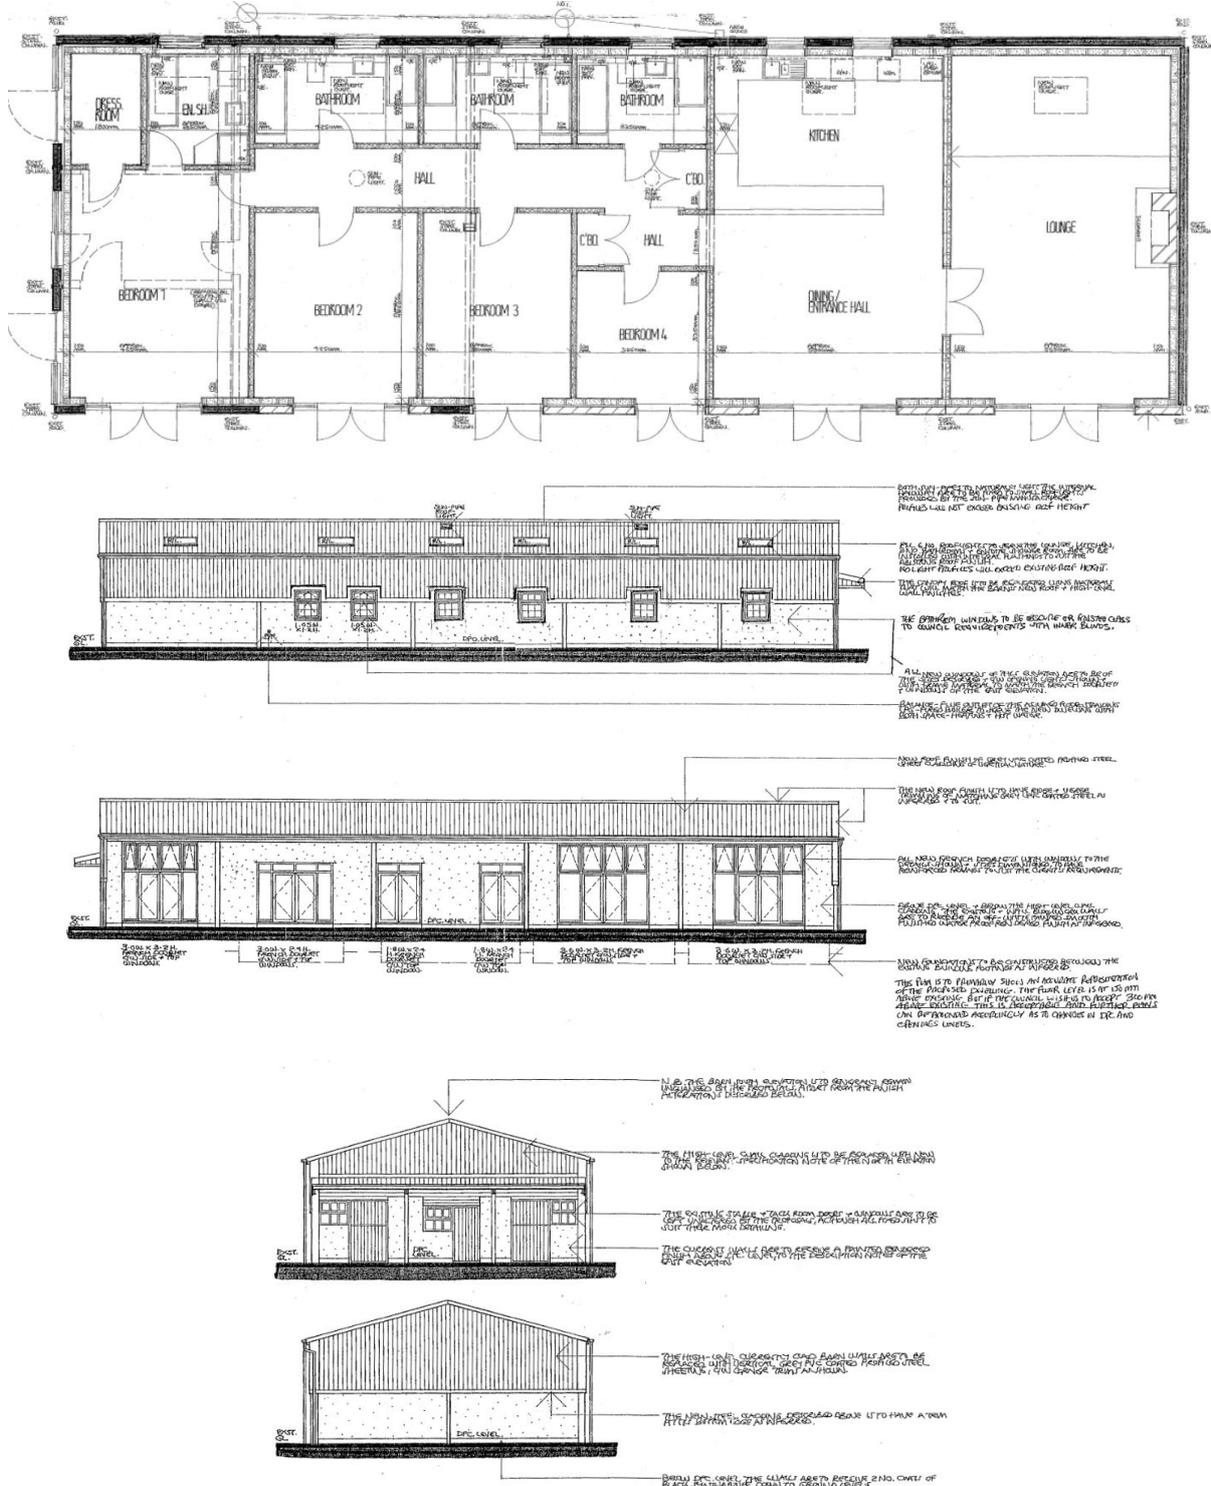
Historic floor plan and elevations as submitted with reference: 18/0174/PAC
